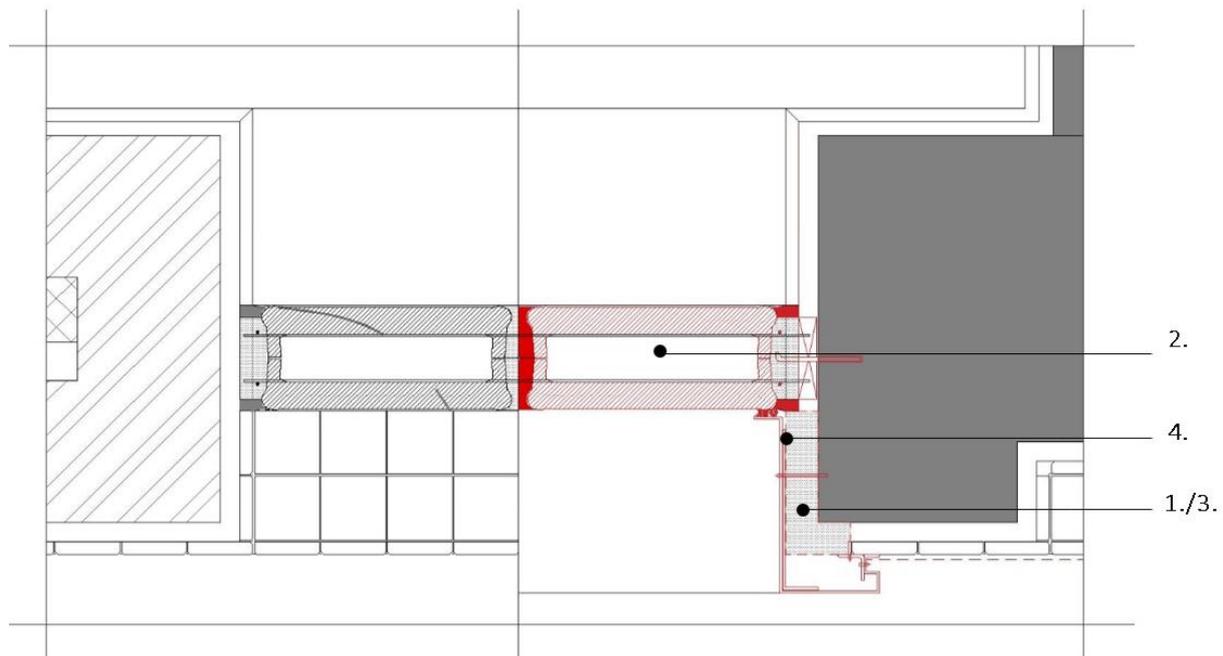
Proposed repair approach for glass brick window anomaly [3].
